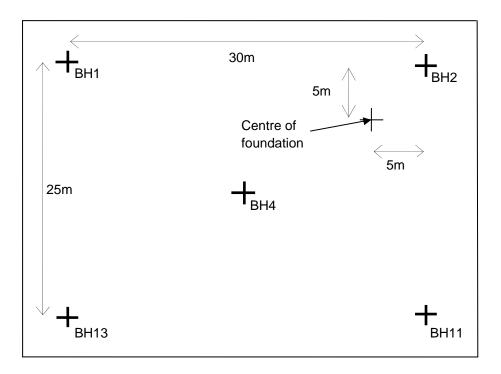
Example 2.2 Site plan and location of SPT tests
